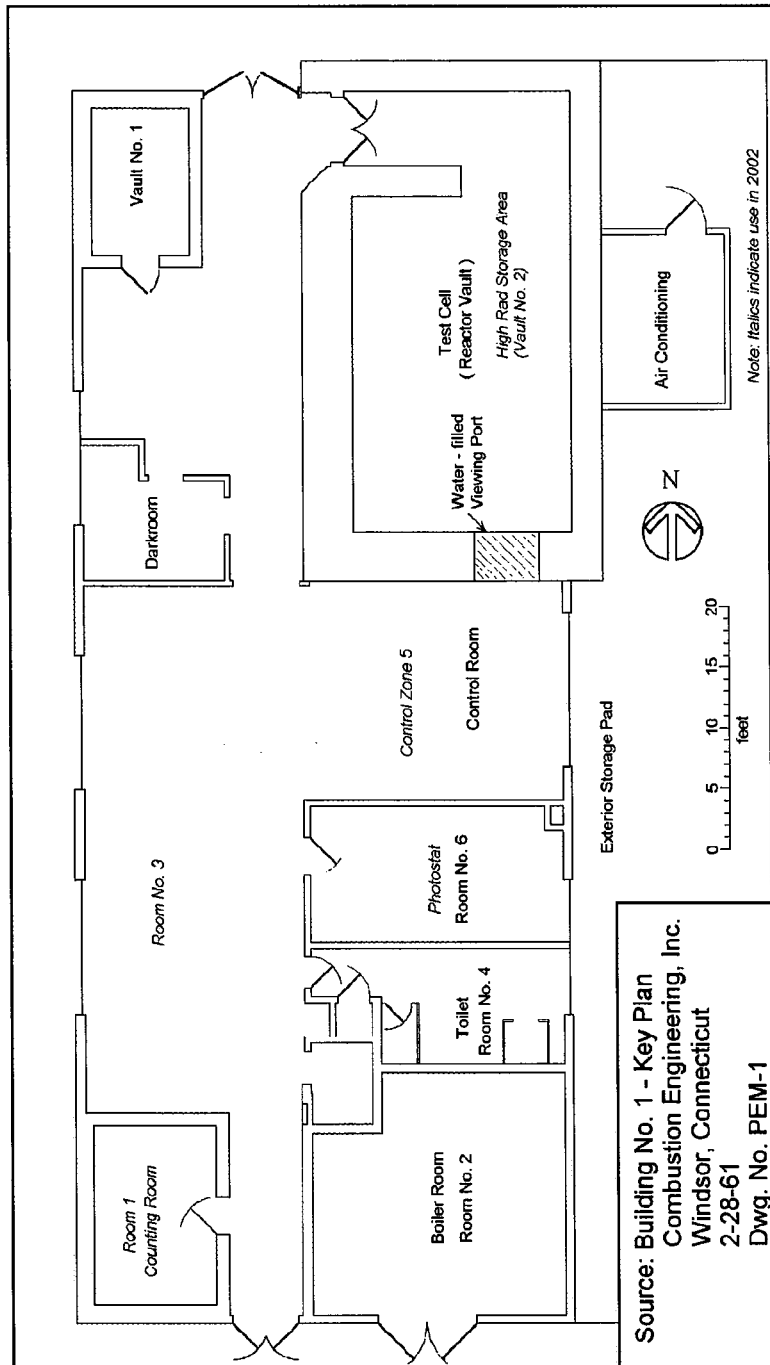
Floor Plan of Building No. 1 - Critical Facilities Building
